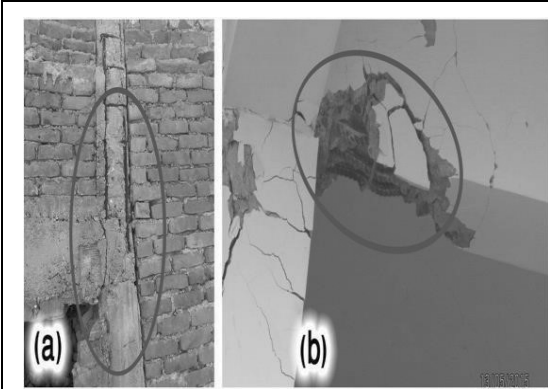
Beam failure: (a) shear failure; and (b) flexural failure.
